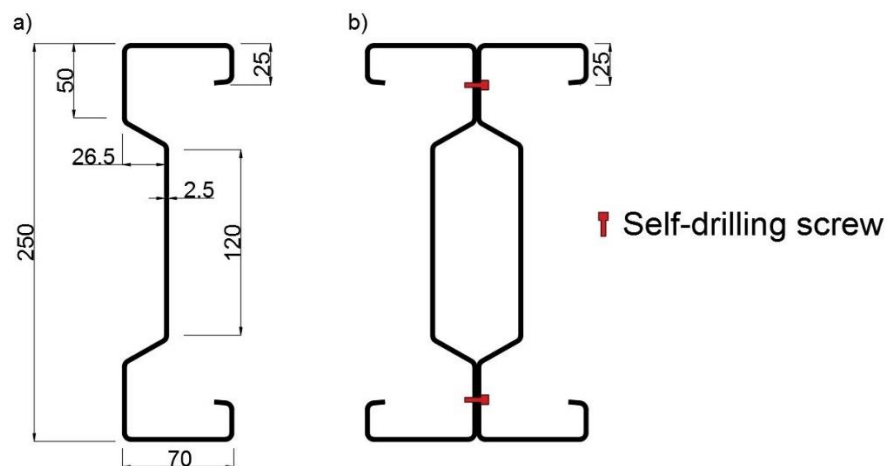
Dimensions of the cross-section studied (unities in mm) a) single and b) built-up.
